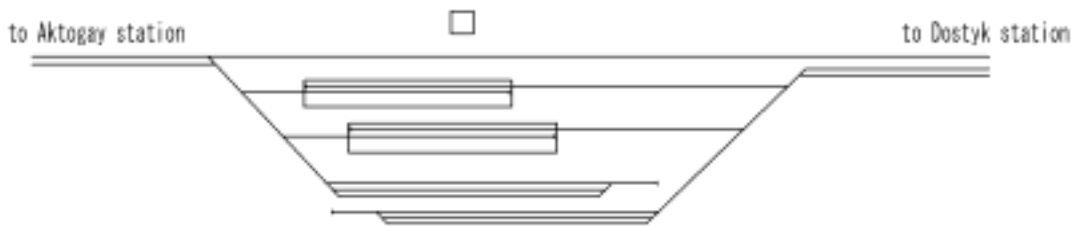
Track Layout Plan for a Dostyk New Container Station
